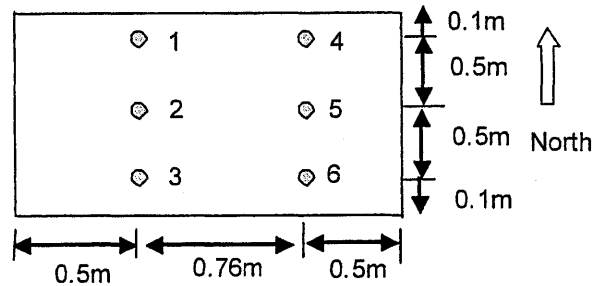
Plan view of the six locations examined in the 3rd floor north room
